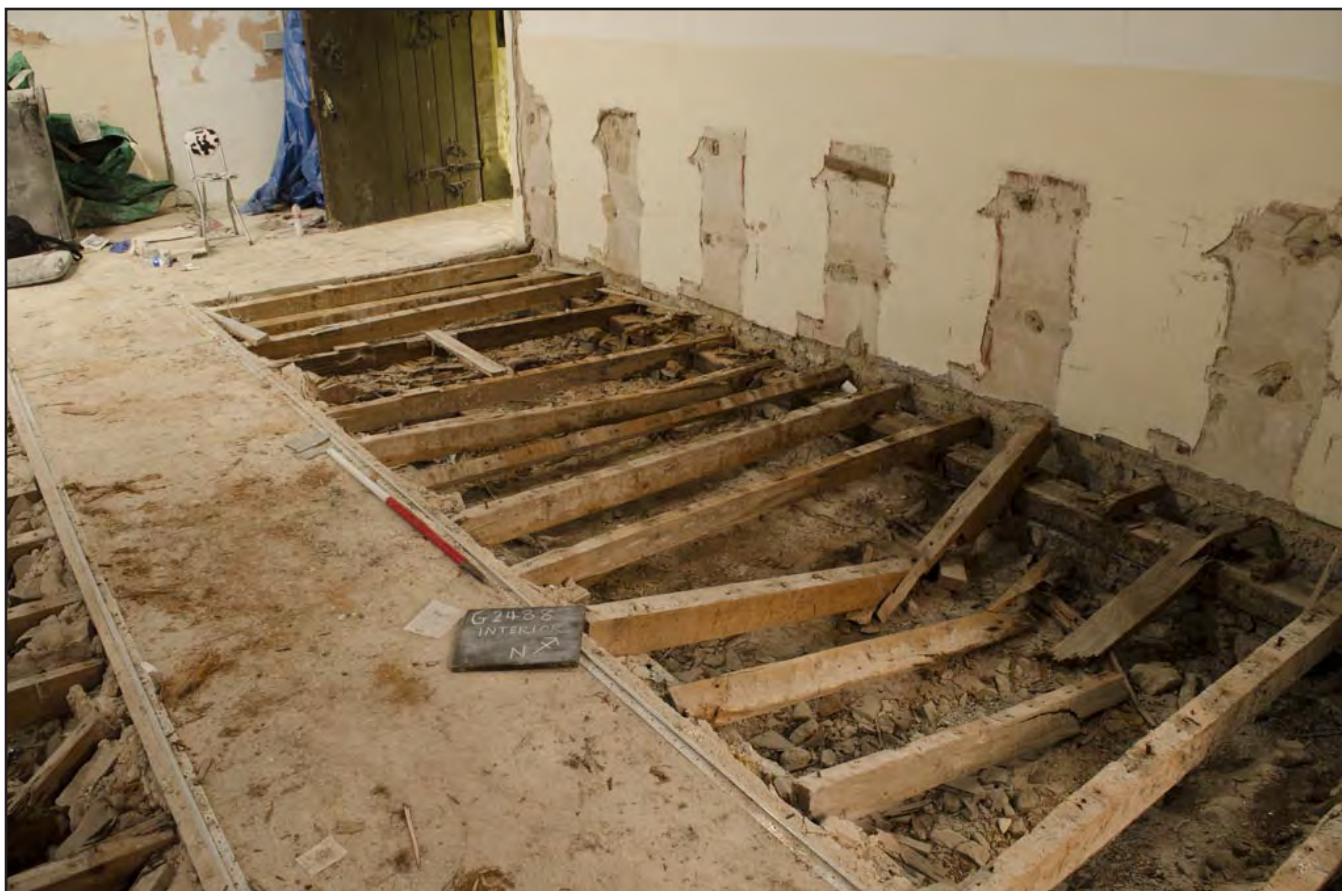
Oblique view of exposed floor joists along northern wall of church; scale: 1x1m (archive reference: G2488_086).
